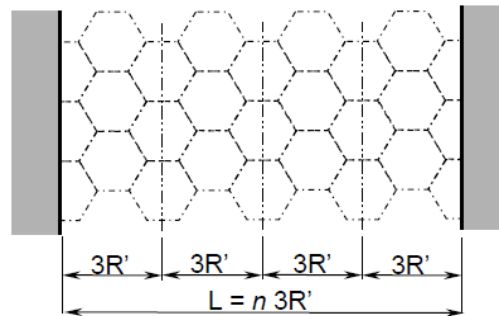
Details from the French Hexagonal Precast Pavement Guide
